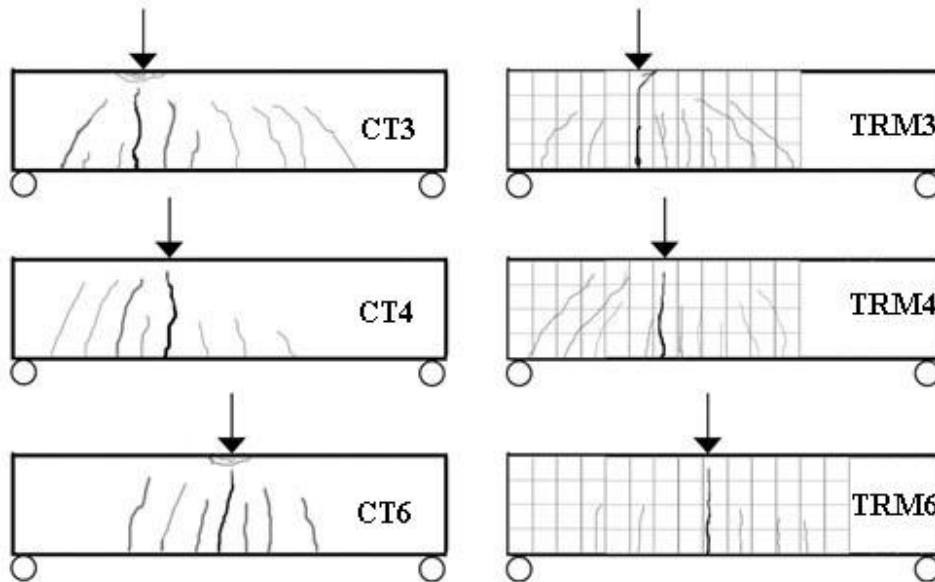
Crack patterns and crack spacing of control and strengthened beams at failure
